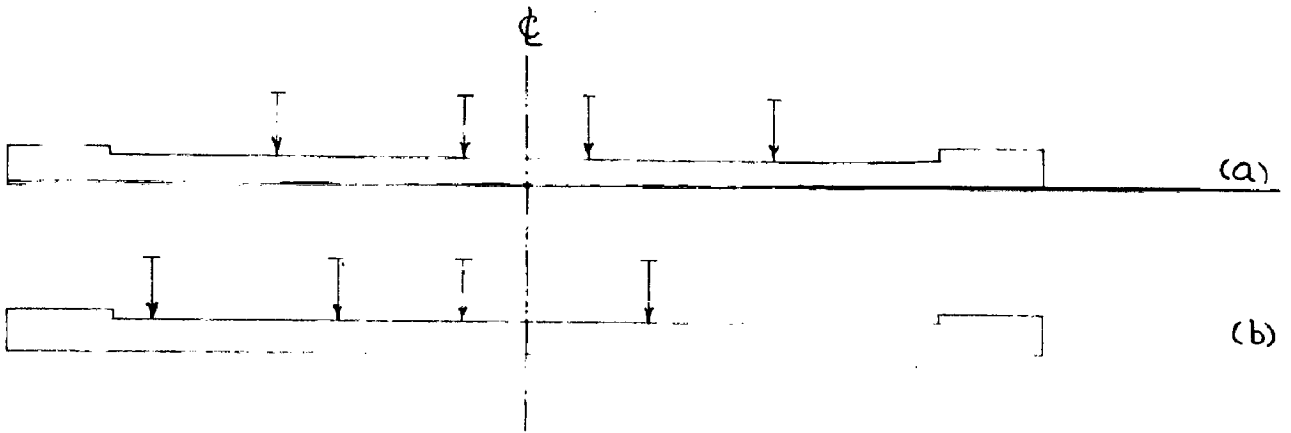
LOADS ON A BRIDGE CROSS SECTION
